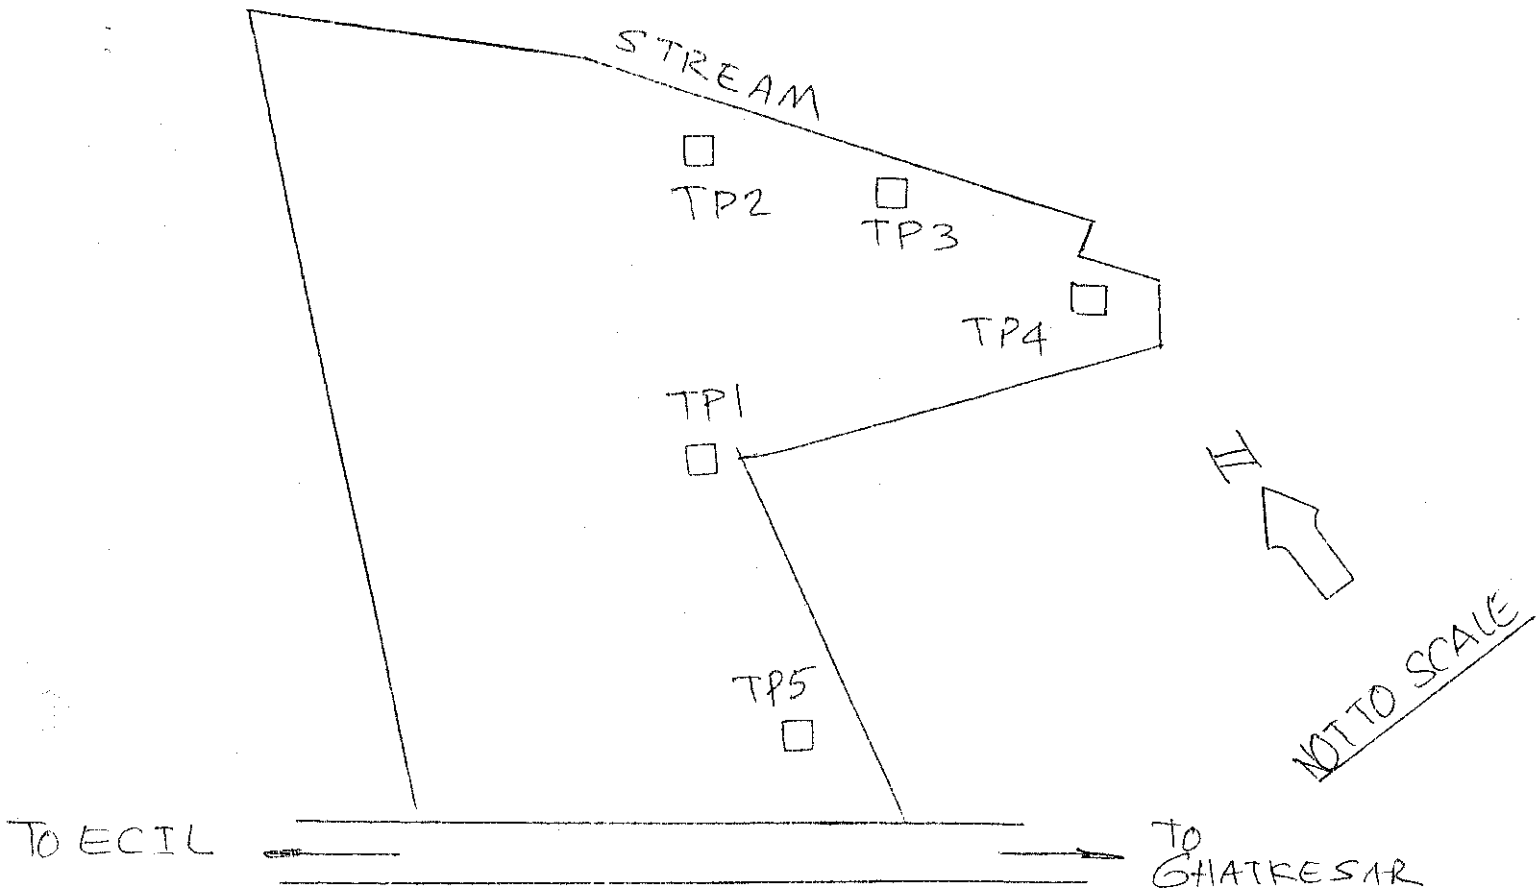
SITE PLAN OF PROPOSED BUILDINGS AT RAMPALLY, KEESARA (M), R.R.D.T.
